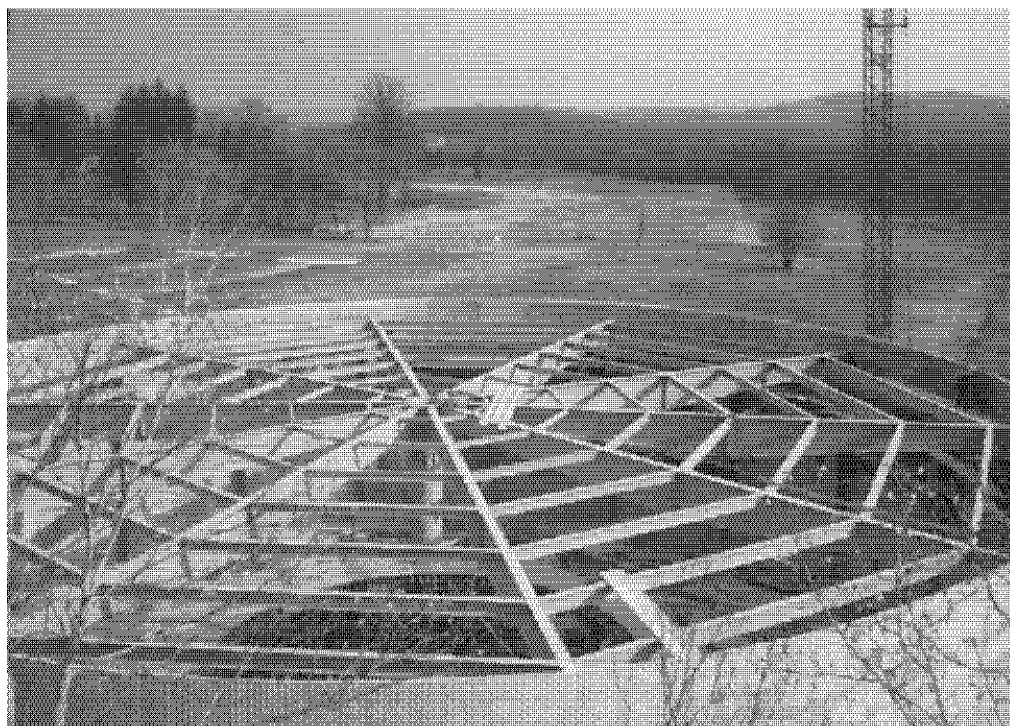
Construction view, rotunda steelwork in place, December 1960.
